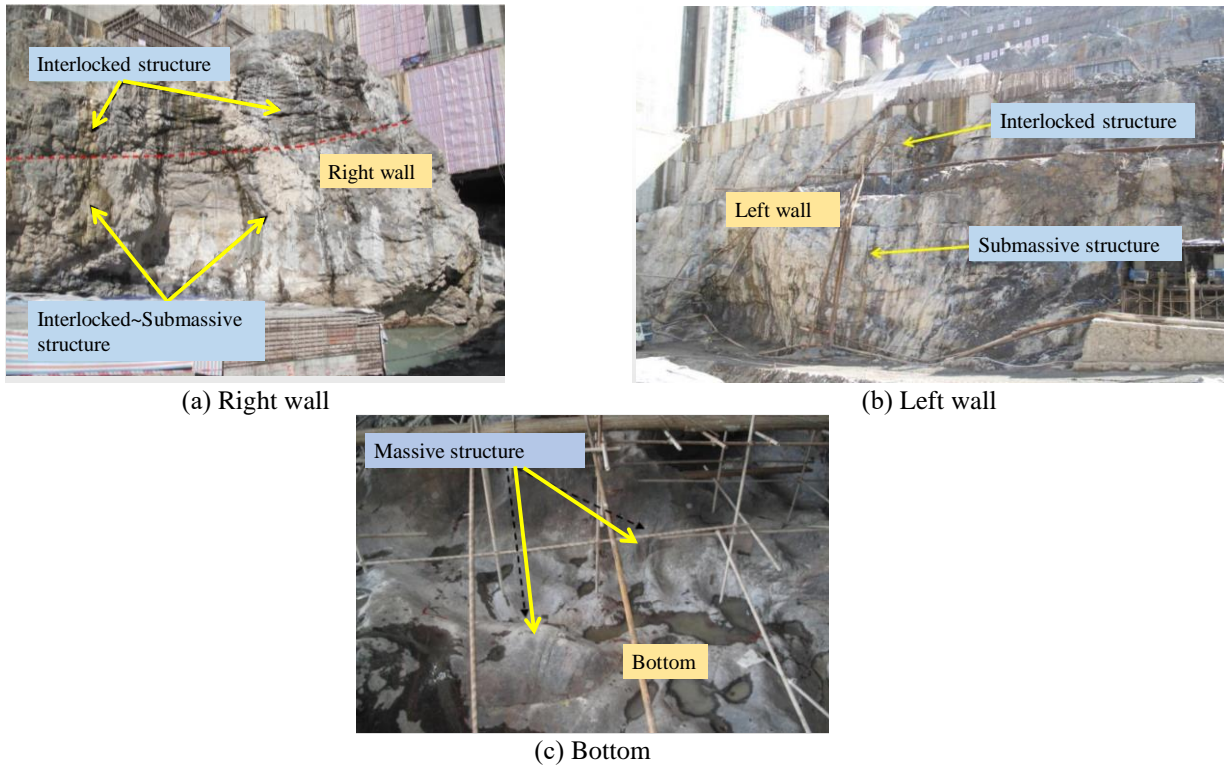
Rock mass structure of left wall, right wall and bottom of deep groove
